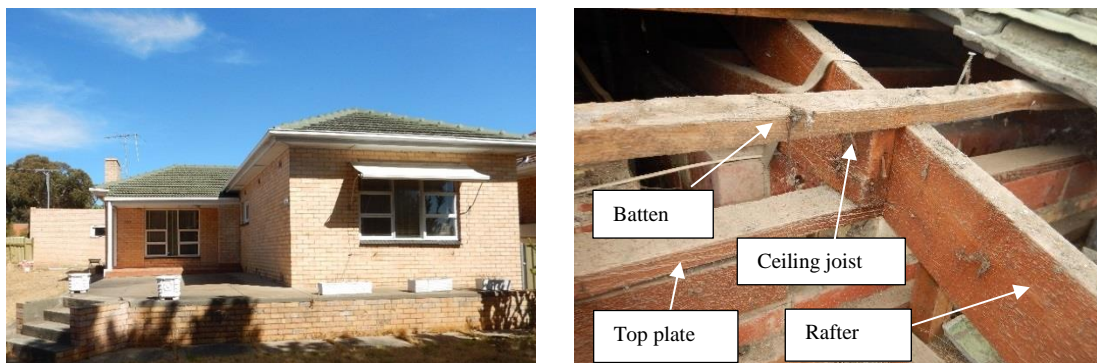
TYPICAL 1960S HOUSE SURVEYED (LEFT) AND ROOF TO WALL CONNECTION DETAILS (RIGHT)
